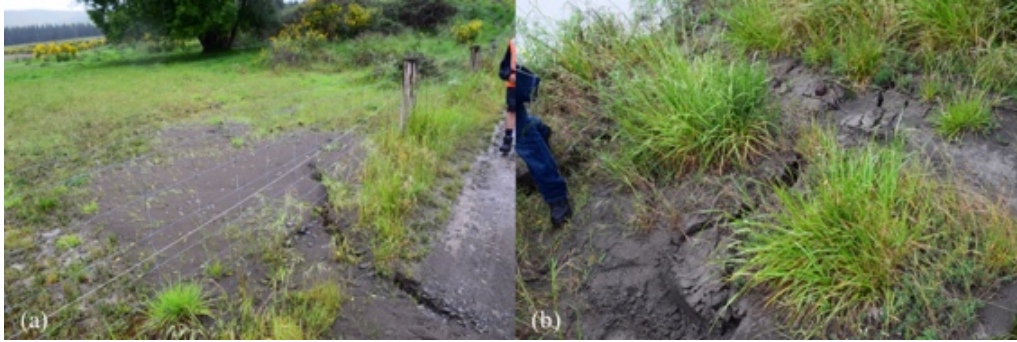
Surficial evidence of liquefaction at western approach to Waiau River Bridge: (a) Ejecta and cracking adjacent to southern toe of approach embankment [-42.6558, 173.0297]; (b) Lateral spreading cracks near river bank [-42.6556, 173.0312].
